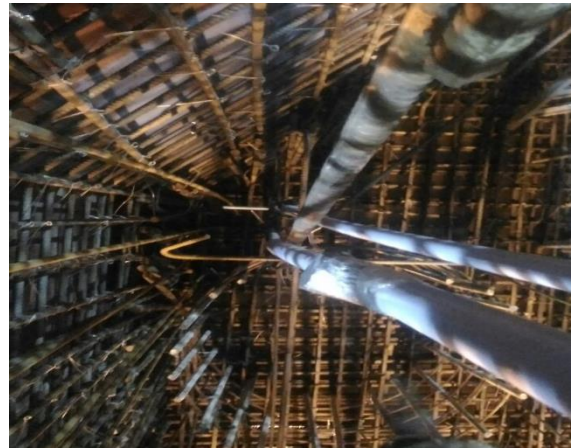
SECTION XX - PILE CAP X6 (9PC1) SHOWING LAYER WISE FIXING ARRANGEMENT OF THERMOCOUPLES AT BOTTOM, CENTER AND TOP
